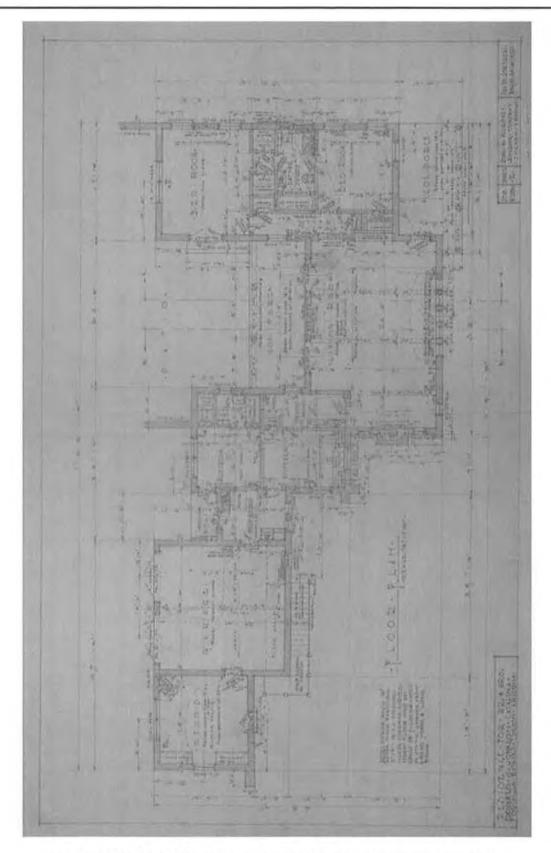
, Joesler Floor Plan (Johnson House) 1936, Arizona Architectural Archive.
